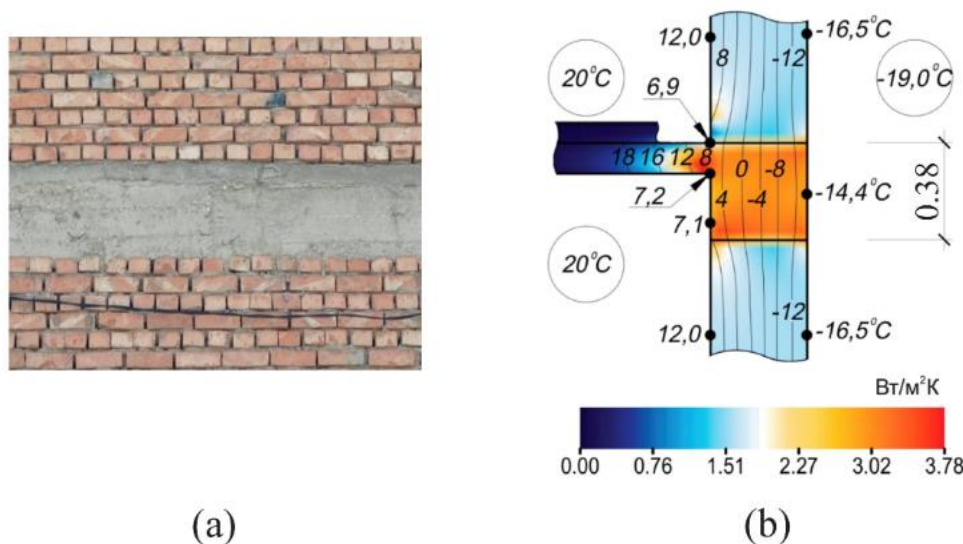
Connection construction of a monolithic inter-floor ceiling and brick wall: (a) exterior appearance; (b) Isotherms and heat flow intensities
